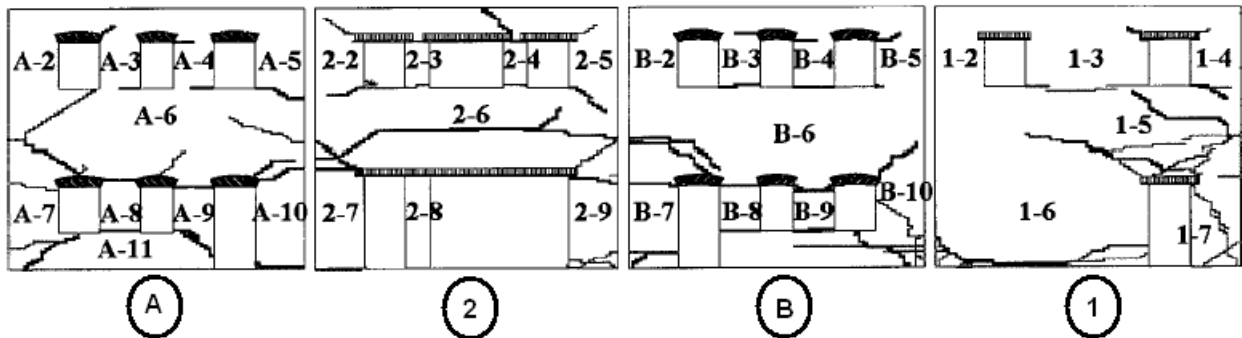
Pre-existing and final crack pattern for test structure for in-plane wall tests parallel to Walls A and B (gray line: pre-existing cracks; black line, cracks formed during tests)
